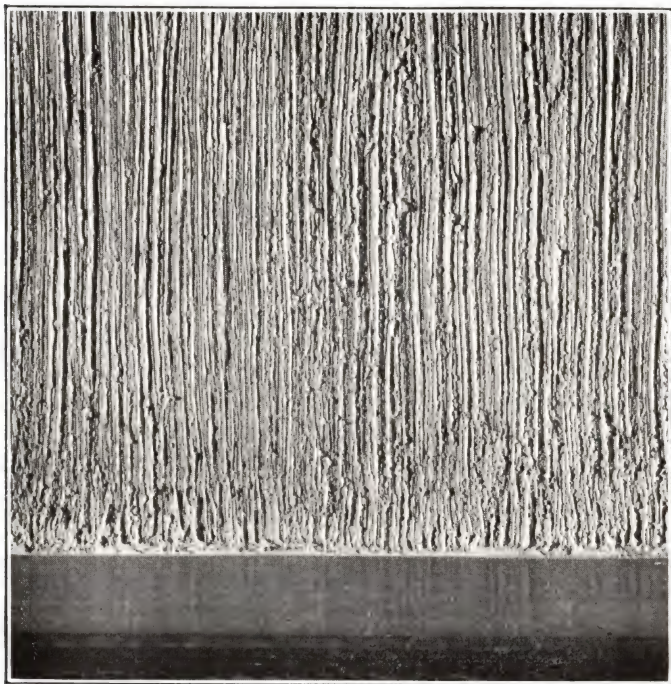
A Close-Up View of the Texture Shown on Plate 55.
